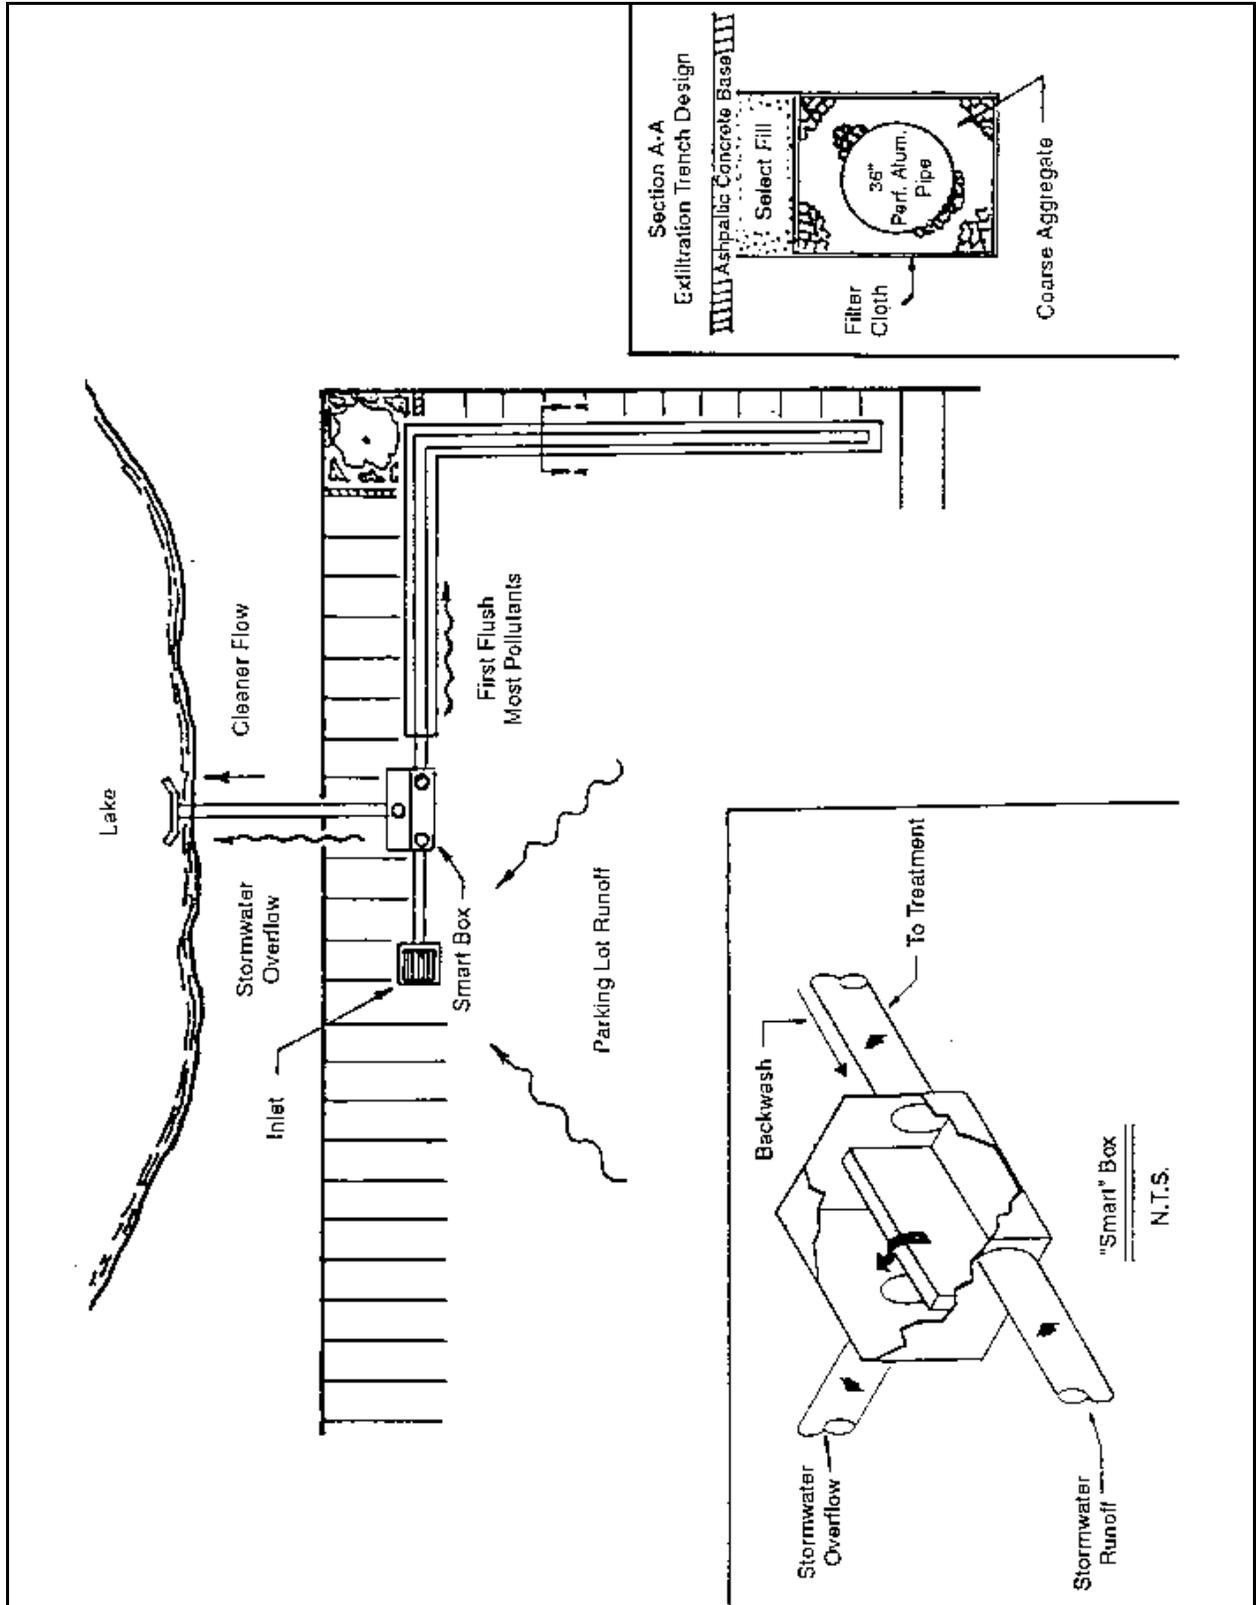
Cross-Section of Typical Infiltration/Exfiltration System for Parking or Roads
